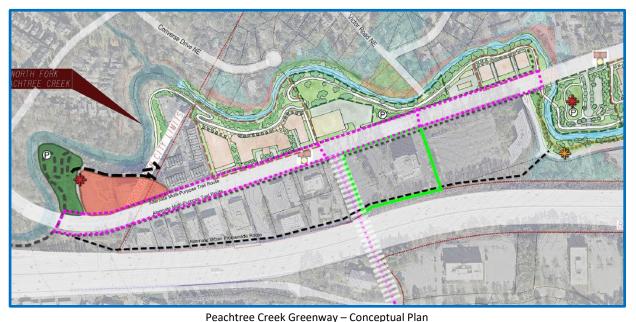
Streetscapes Between Major Connection Points and Trailheads
